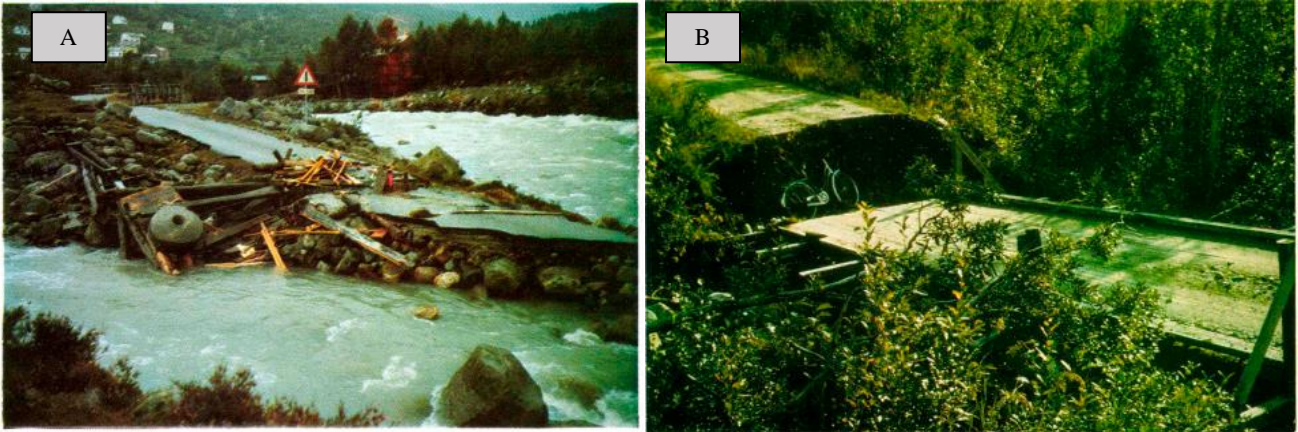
Photos of damage left behind by the flood in 1979 A) Brelvi breaking through the road & B) Elvekrok bridge collapse (NVE, 1981)
